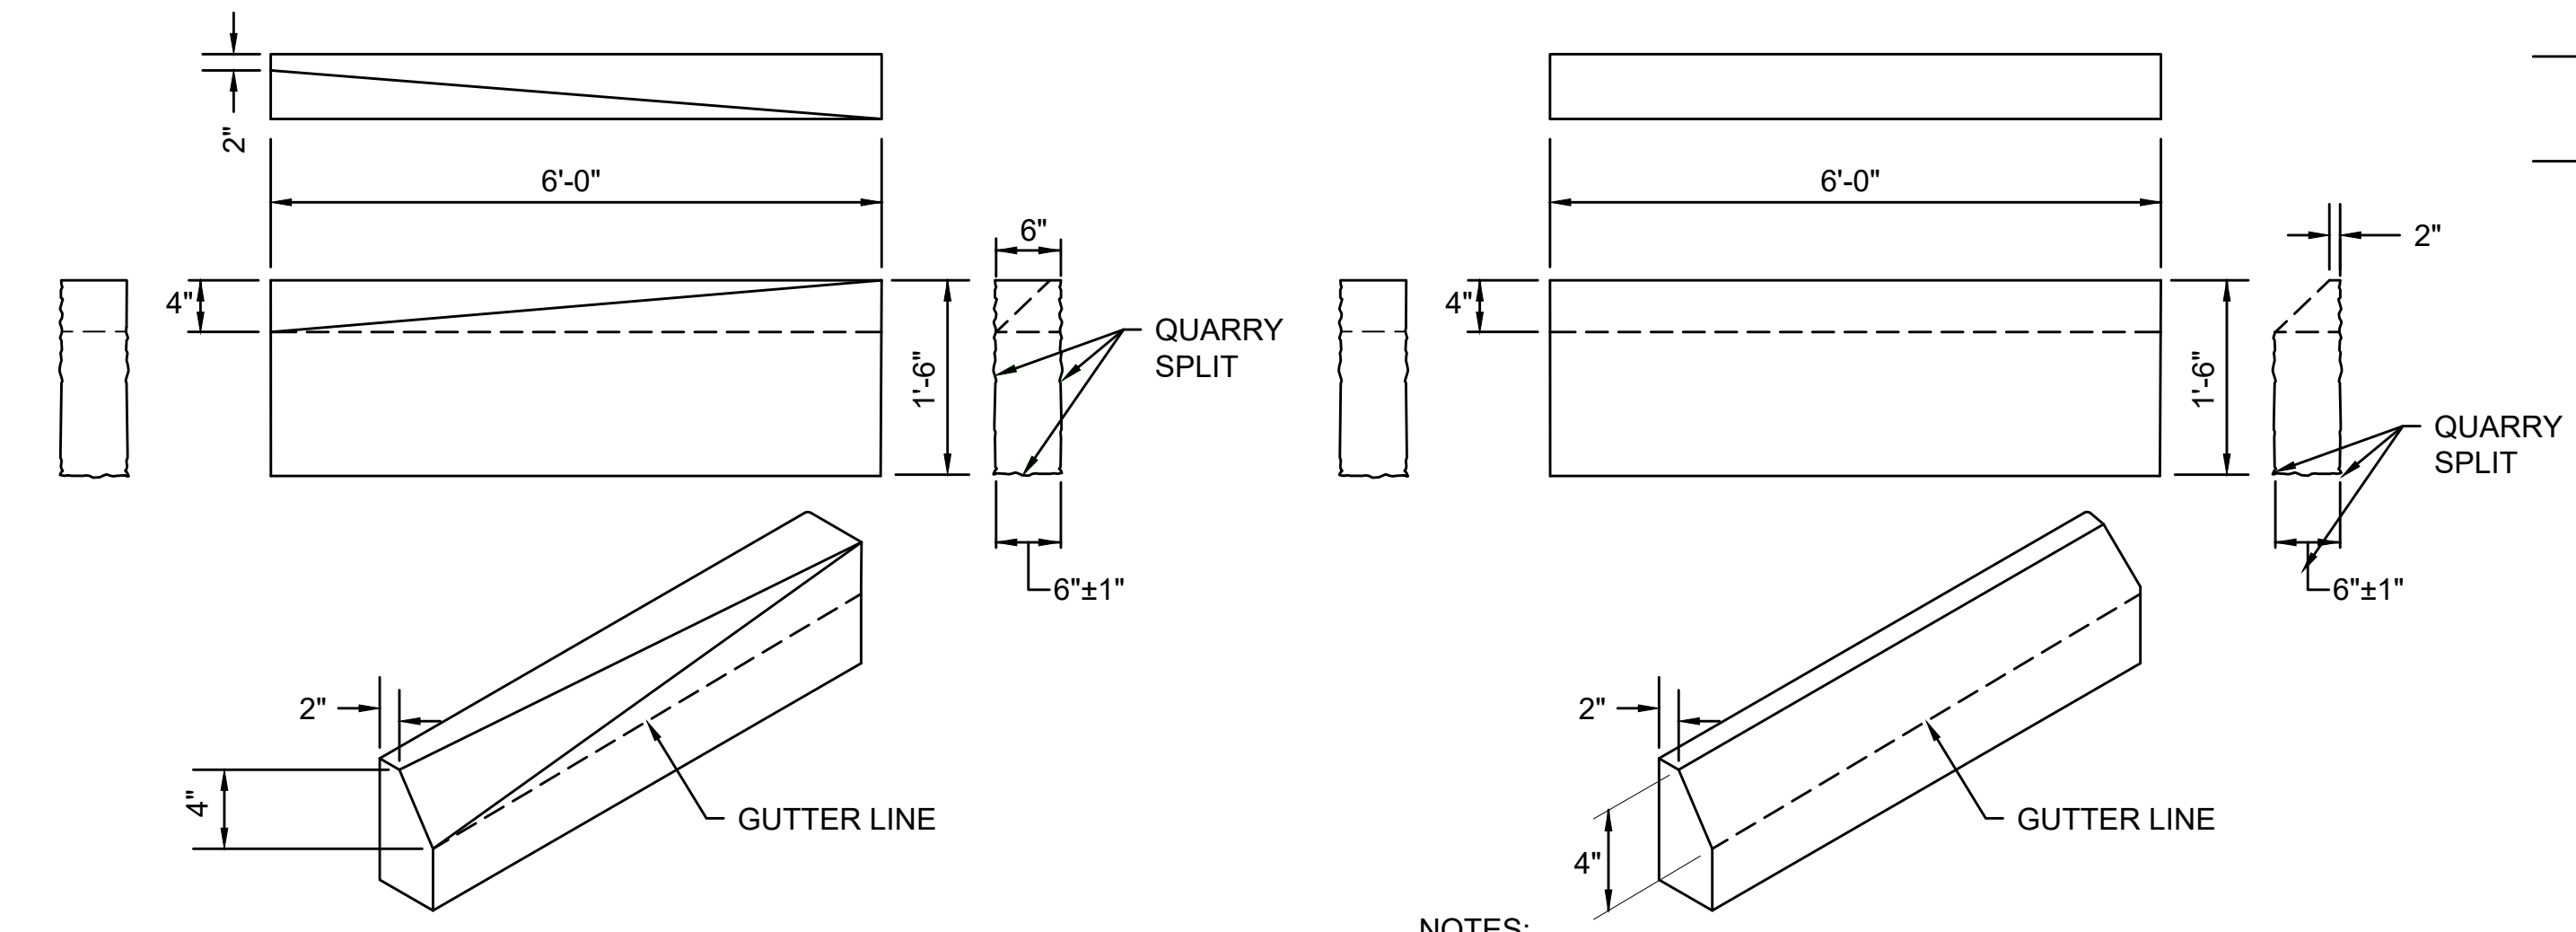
DETAIL FOR GRANITE CURB AT BACK OF SIDEWALK
